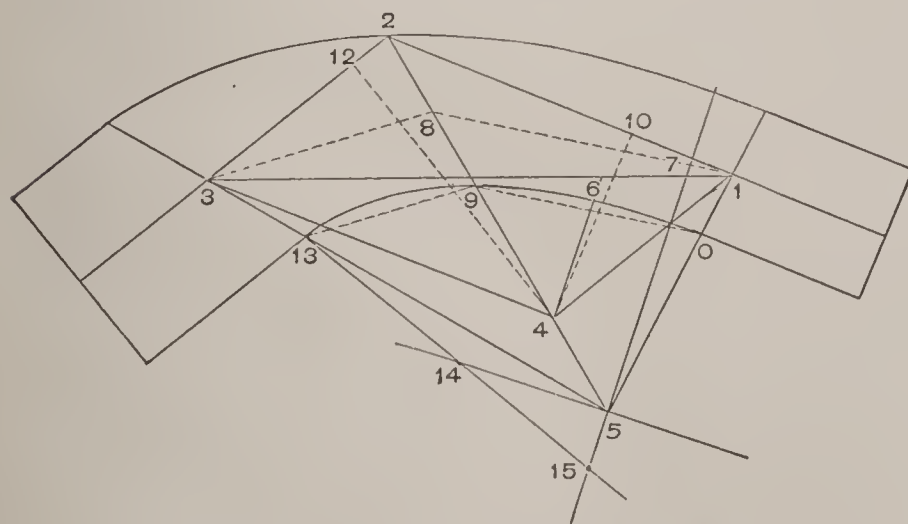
SHOWING MANNER OF DRAWING MOULD.
